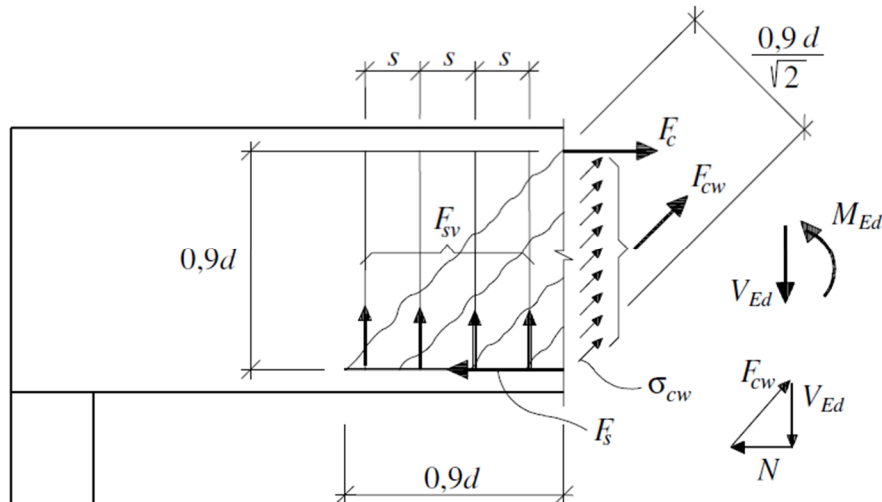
Truss model for RC beam section with shear reinforcement after cracking (Al-Emrani et al., 2013).
